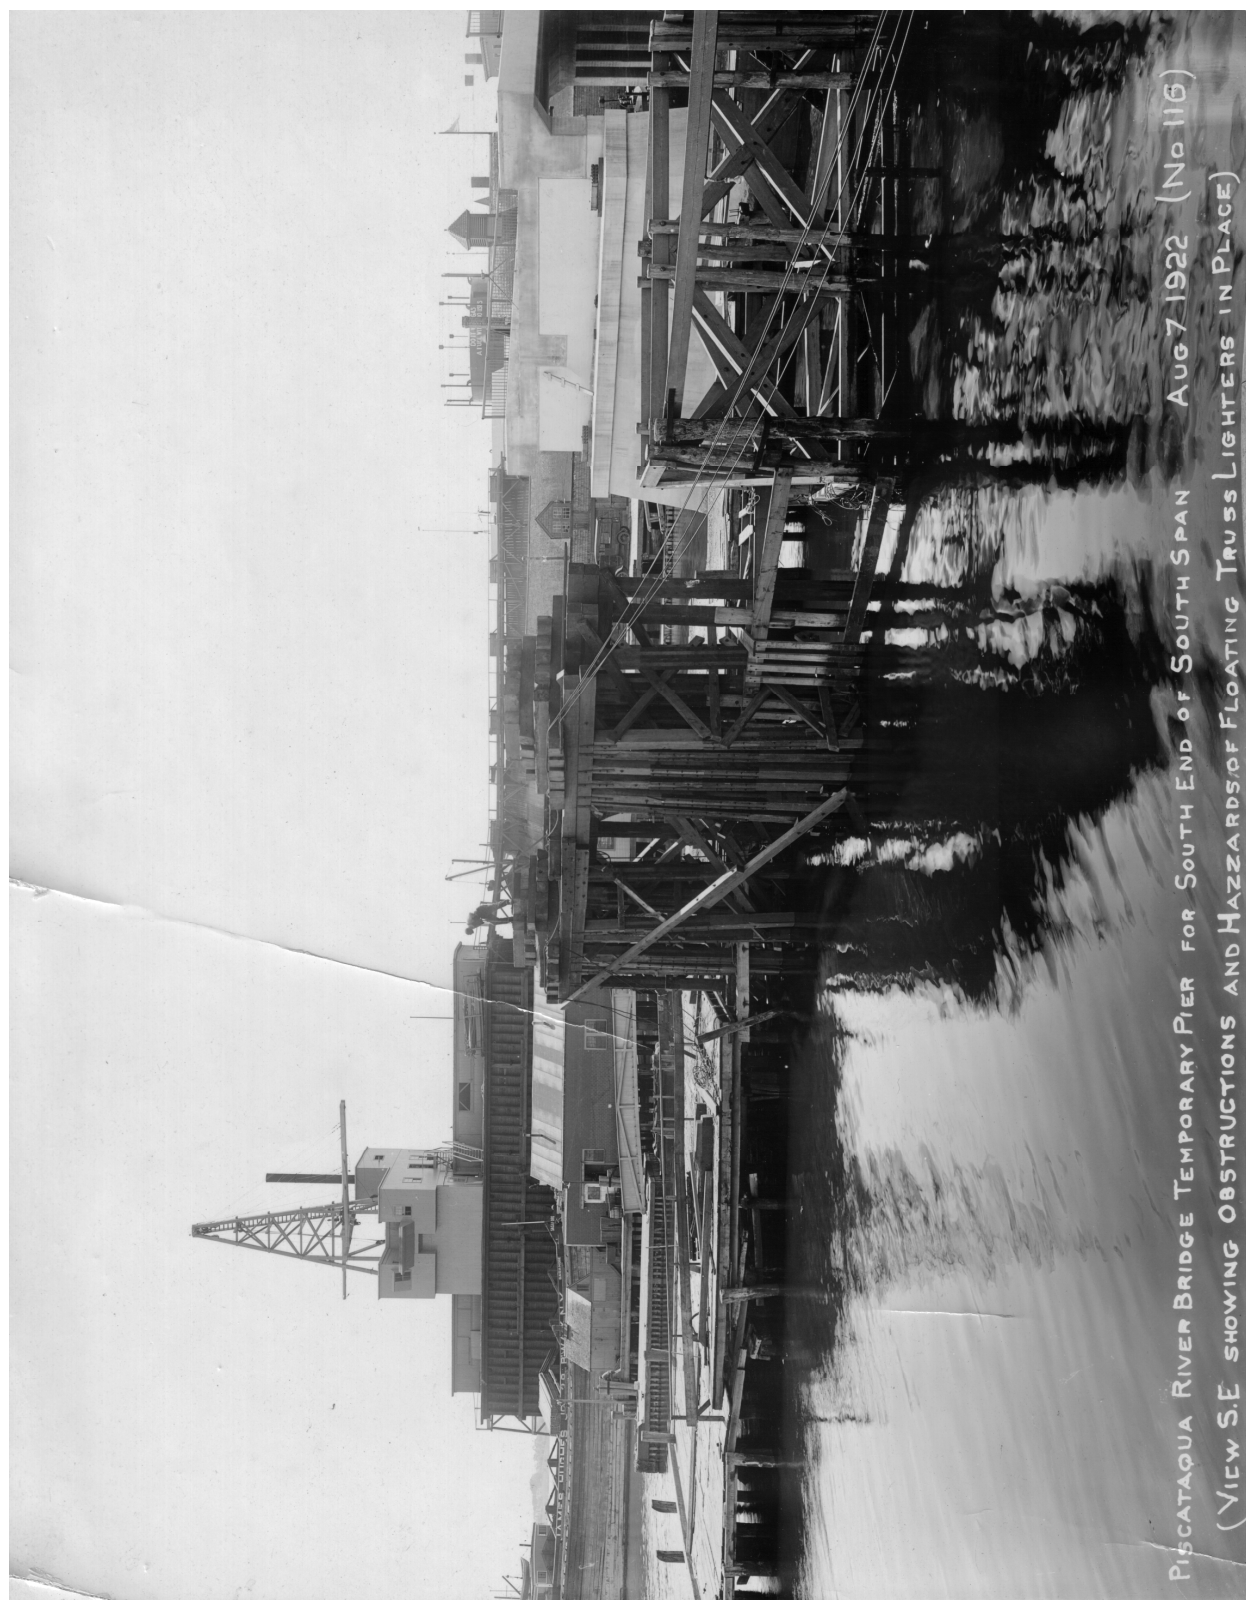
Temporary Pier for South End of South Truss Span, Aug 7 1922 (Portsmouth Athenaeum-Norris Collection 1419)
